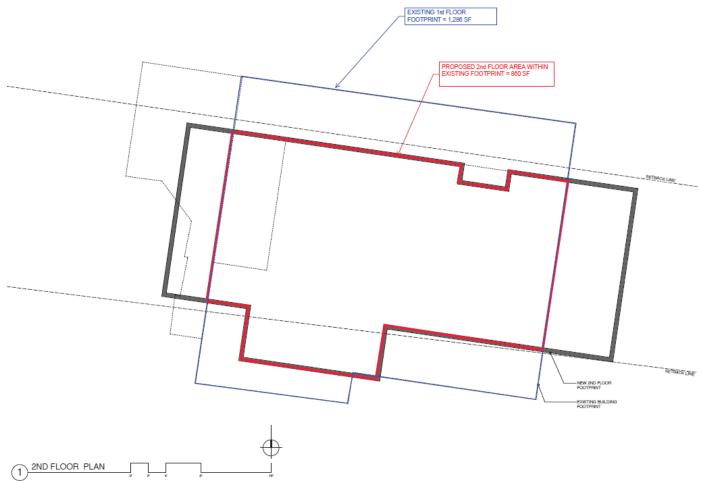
Existing First Floor Footprint vs. Proposed Second Floor Area Analysis
